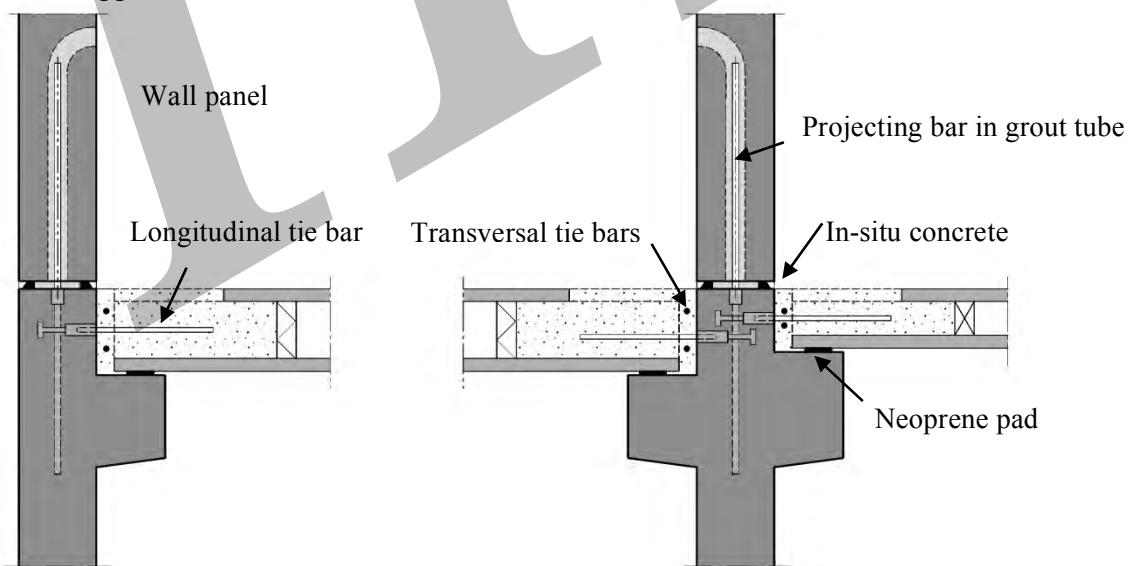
Typical examples of wall connections with hollow-core floor
